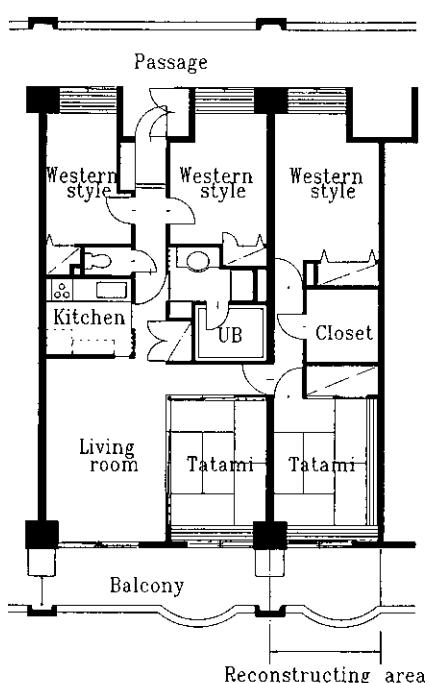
Reconstructing plan to add next rooms in future (Miyazaki)
